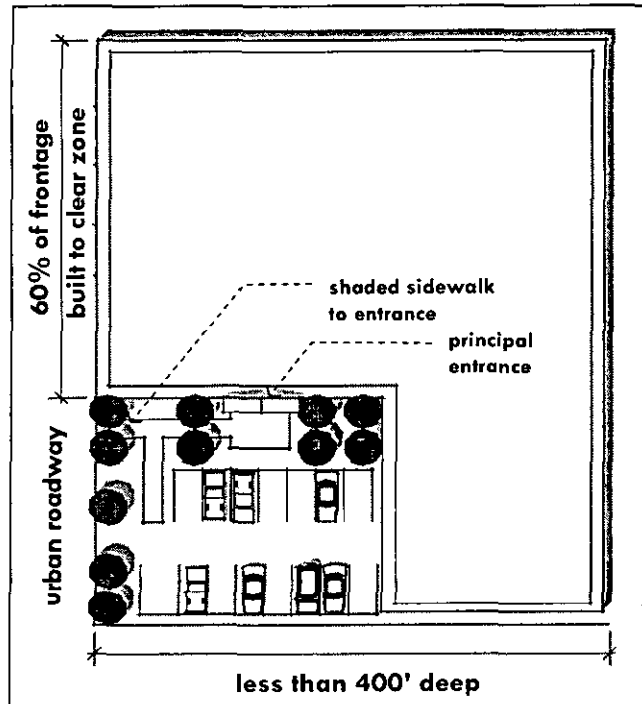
Parking is permitted between the building and the roadway on shallow lots less than 400 feet deep, when certain conditions are met.
